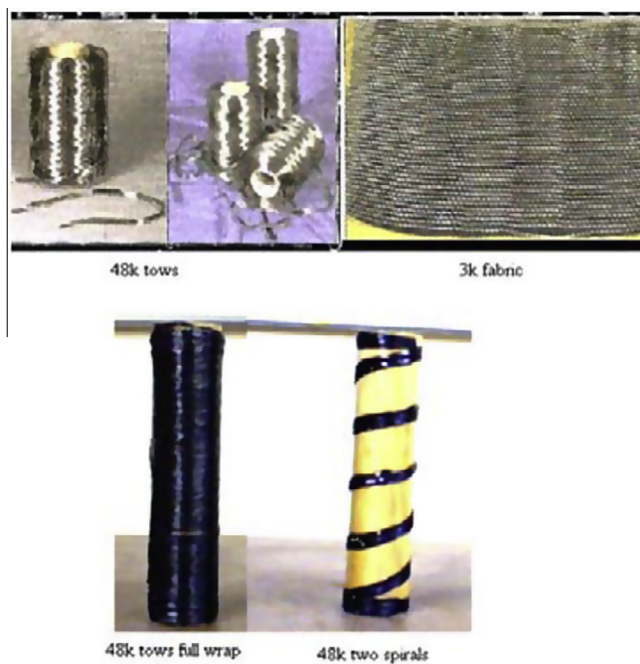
Column specimens and carbon reinforcement used by Najm et al. [16].
